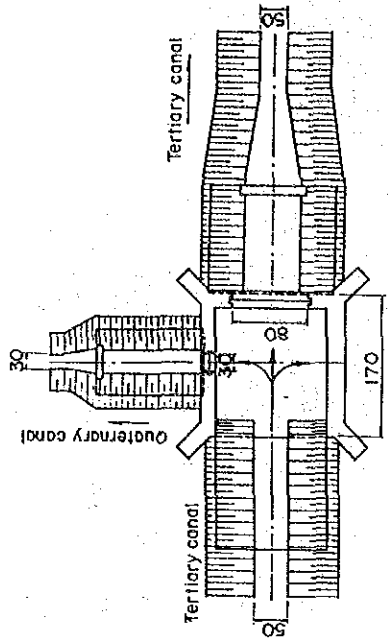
Typical Layout of On-farm Facilities (2/4)
